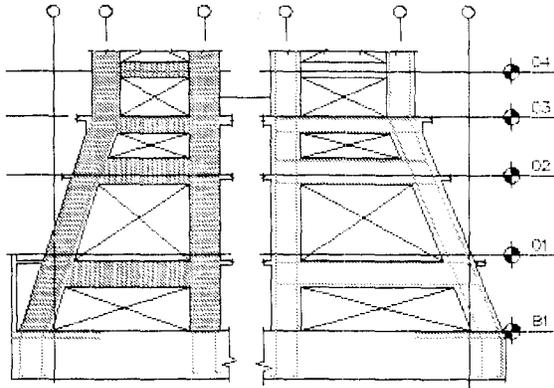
Sloping SMRF's from Level 3 to the Basement Foundation
